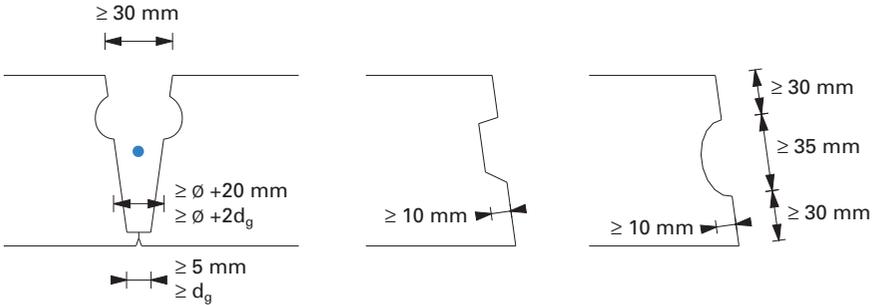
Longitudinal joint: shapes and minimum dimensions (proposed in the European Standard EN 1168 Art. 4.3.1.4 and Informative Annex B)
